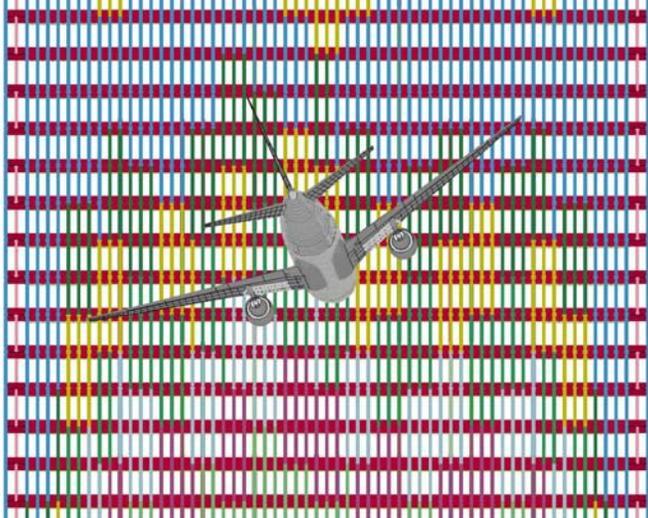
Elevation showing the aircraft impacting the north face of the tower.
